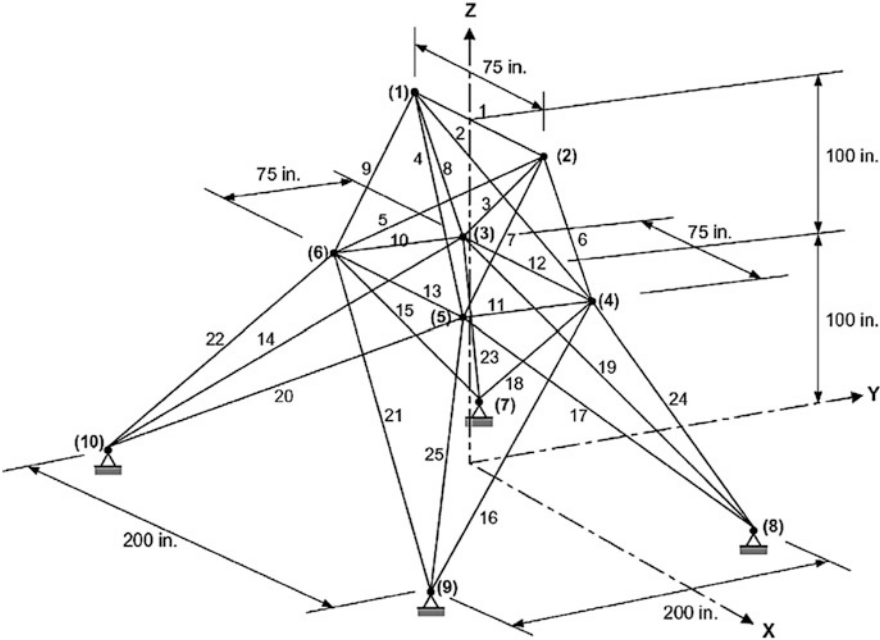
Schematic of the spatial 25-bar truss structure
